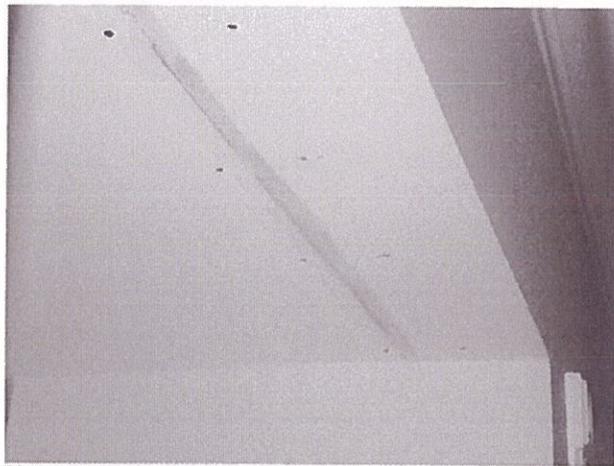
" continued cracking in ceilings and walls, bedroom #3
